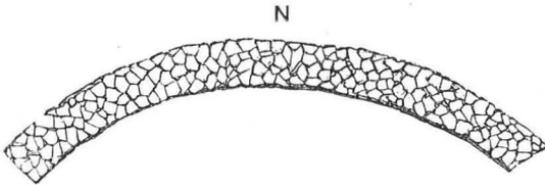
Plan of Platform, 80 feet by 5 feet.
